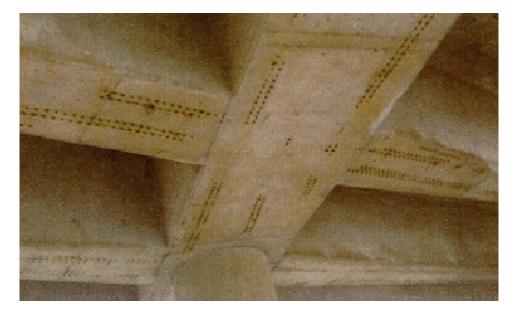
(b) Light Stains on Concrete Surface Indicating Corrosion of Reinforcement
